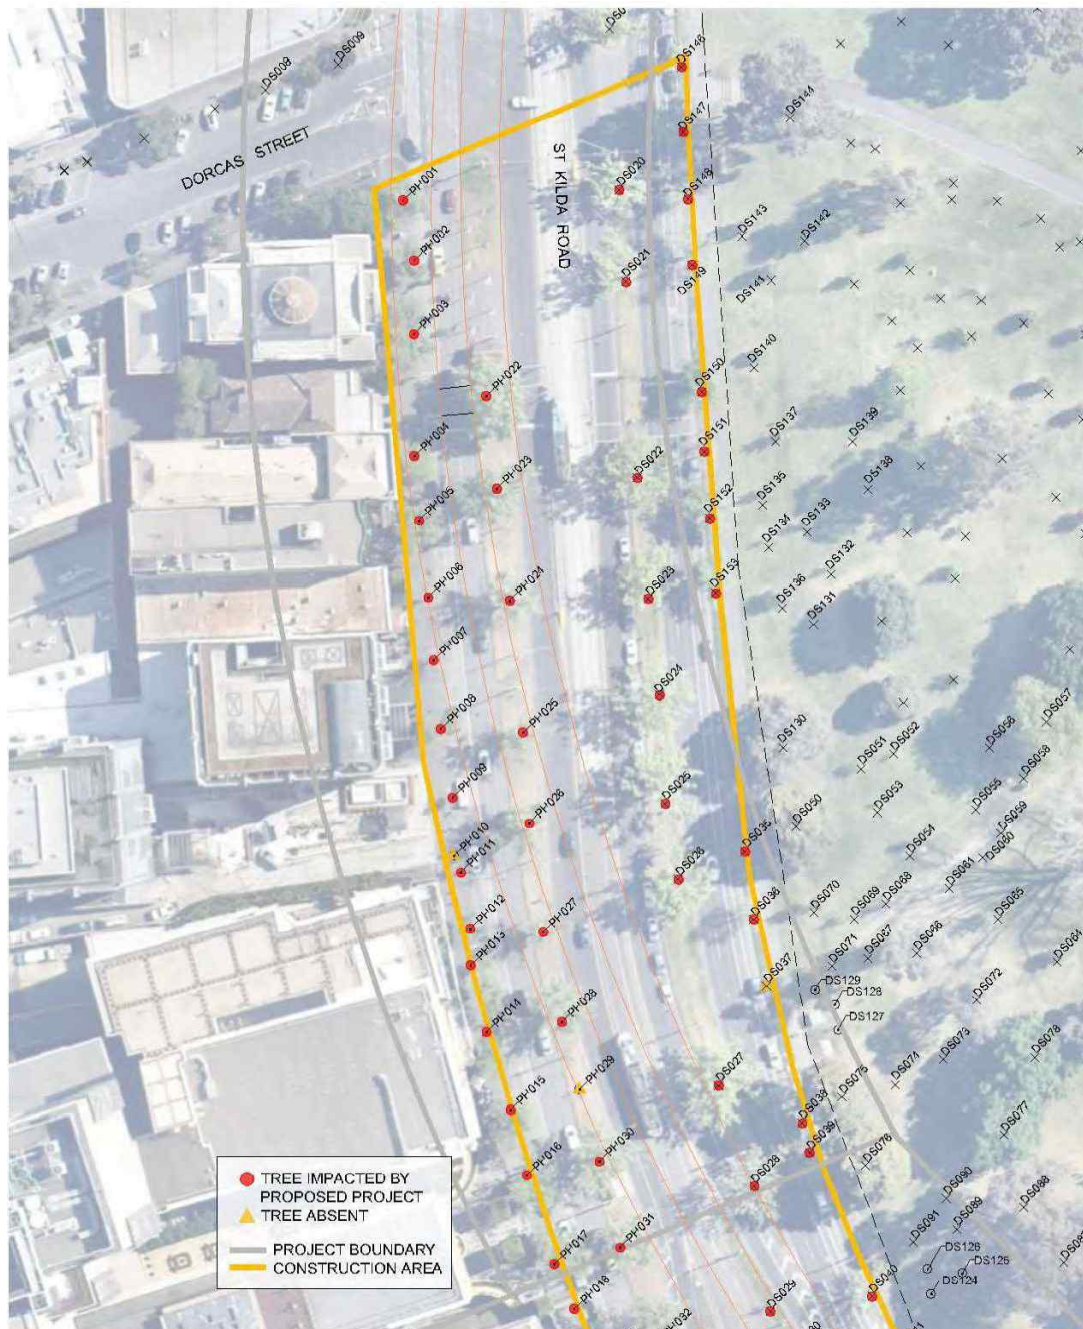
Proposed tree removals in St Kilda Road road reserve section 1
